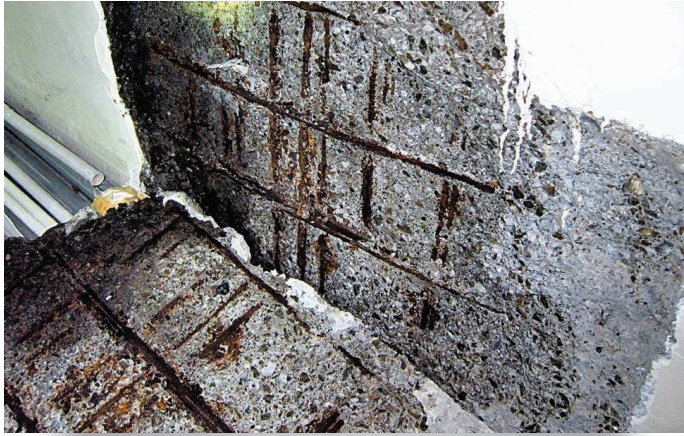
Concrete cover at basement wall delaminated by corroding reinforcement
